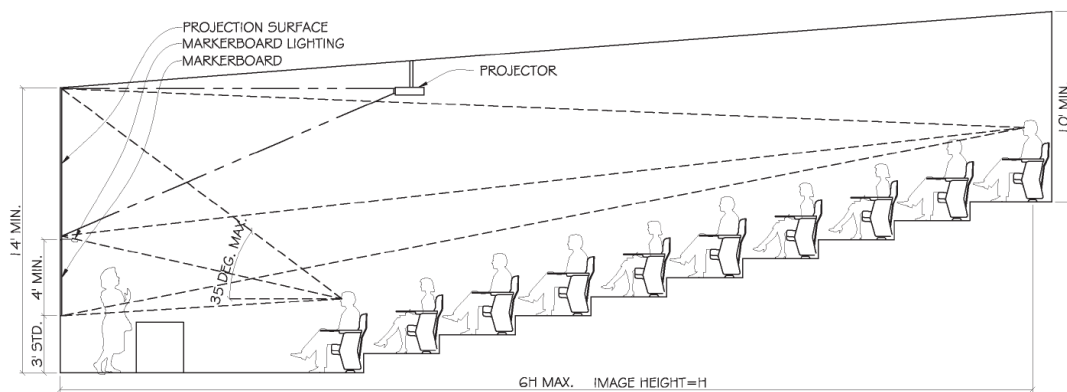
TIERED-FLOOR ROOM SECTION WITH WALL PROJECTION, WITH STANDARD MEASUREMENTS
